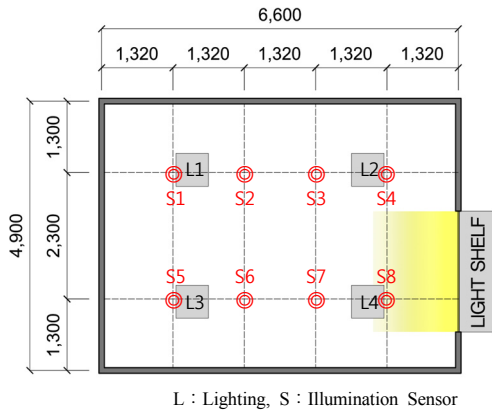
Floor plan of test-bed and location of illumination sensors.
